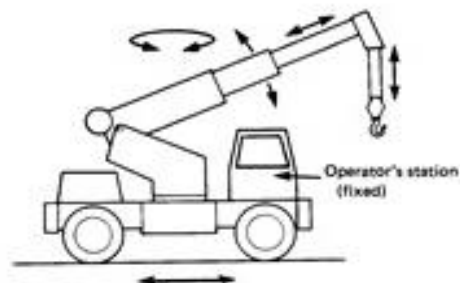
WHEEL-MOUNTED CRANE — TELESCOPING BOOM (SINGLE CONTROL STATION)
